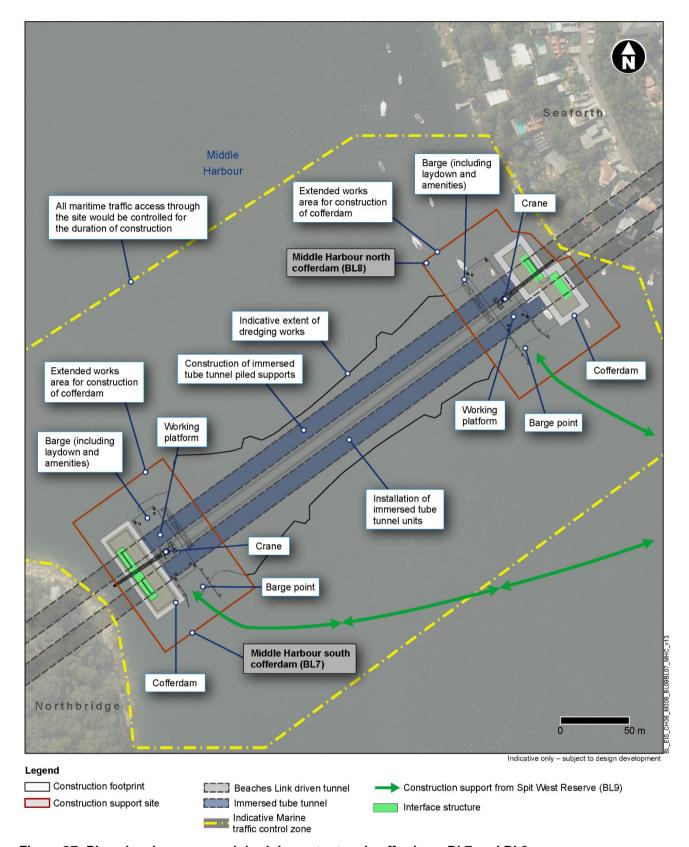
Plan showing proposed dredging extent and cofferdams BL7 and BL8
